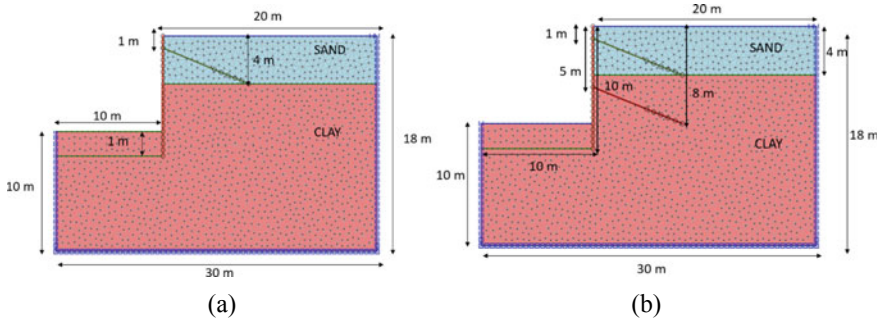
a, b Sheet pile wall system used for numerical modelling in ADONIS software
